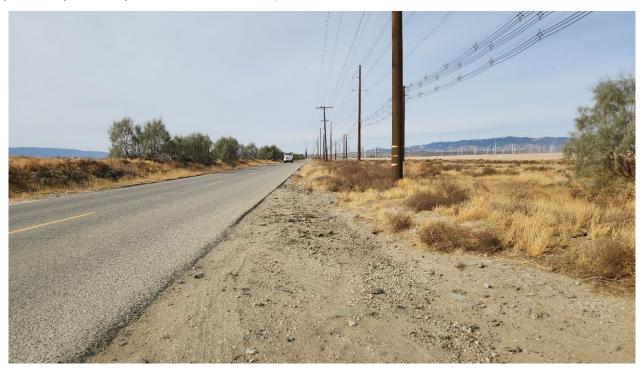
1. Looking west at Drainage 20c. The photo depicts a roadside drainage ditch on the north side of Rosamond Boulevard. Photo taken at intersection with 135<sup>th</sup> Street W.
